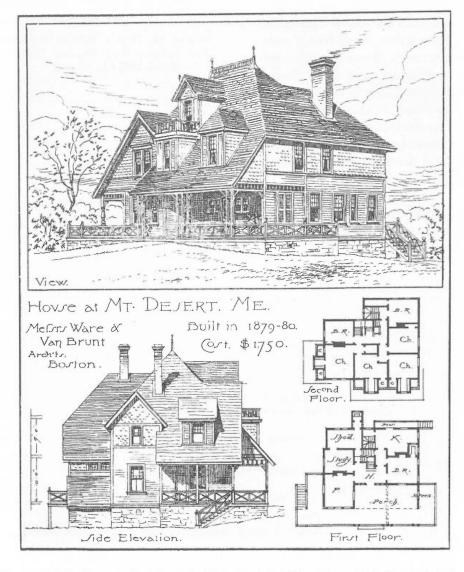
House at Mt. Desert, American Architect and Building News, July 3, 1880 (SPNEA, Boston).
